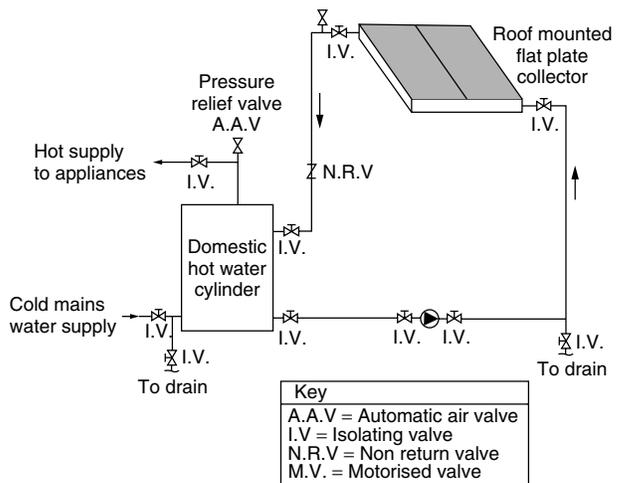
A simplified diagram of a typical roof-mounted distributed (flat-plate) solar water heating installation.
